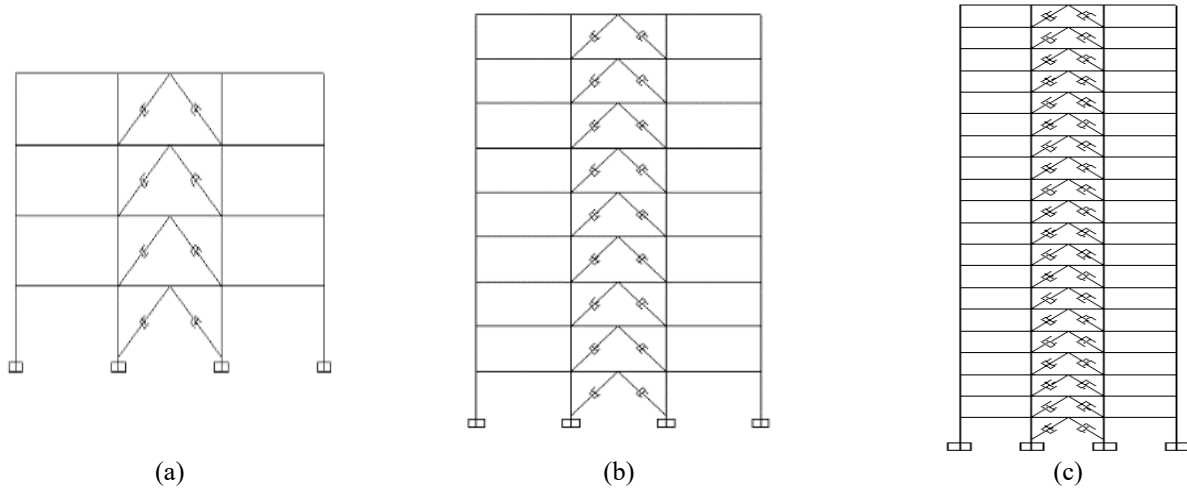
Dampers placement for: (a) 4-storey (b) 9-storey (c) 20-storey
